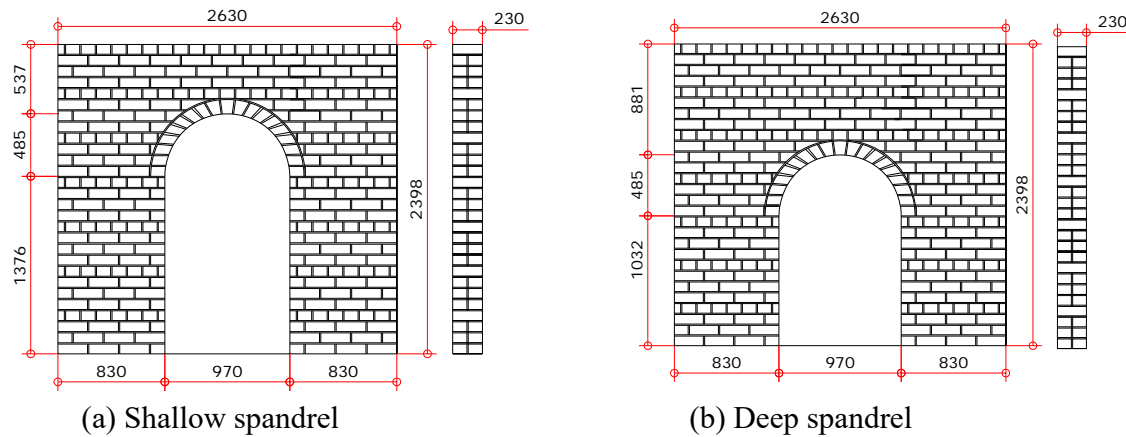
Proposed perforated URM wall geometry (all dimensions are in mm).
